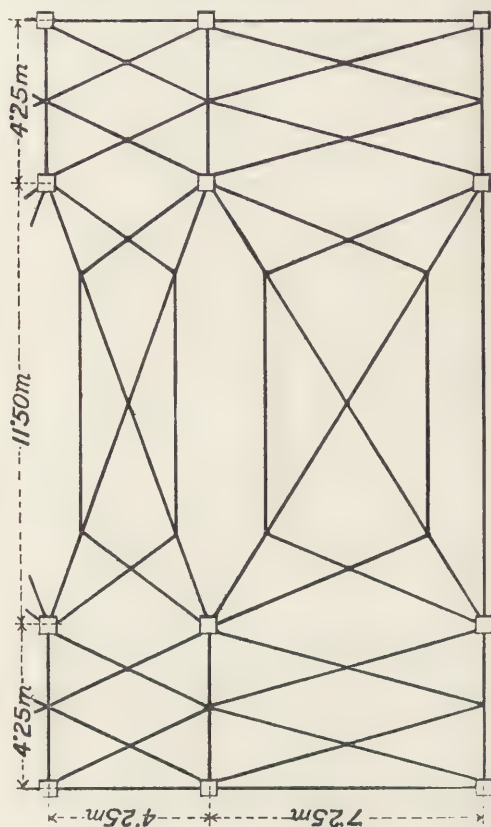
Part Plan of Columns Arched Ribs supporting Church Floor.
